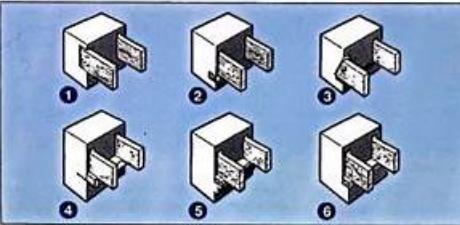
Sketches showing various arrangements for supporting floor joists: (1) joist with square end in pocket; (2) joist carried on wooden wall plate; (3) joist with splayed end in pocket; (4) joist carried on wooden wall plate carried on bracket; (5) joist carried on wooden wall plate on corbelled brickwork; (6) joist carried on wooden wall plate on a ledge formed by reducing the thickness of the wall.
